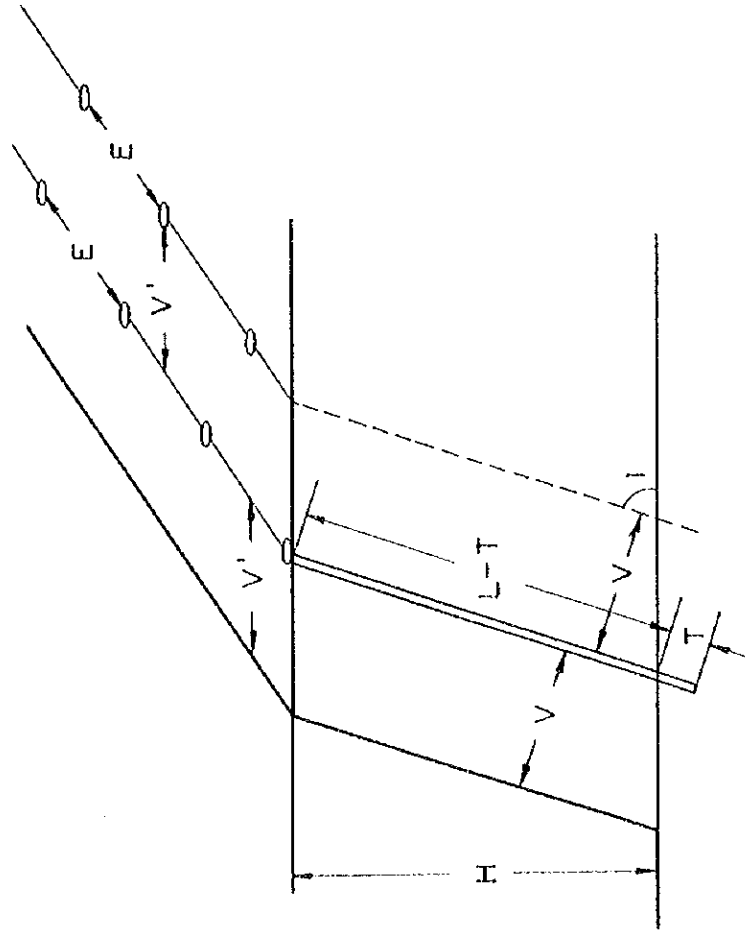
DESIGN OF THE OPEN-CUT DRILLING
